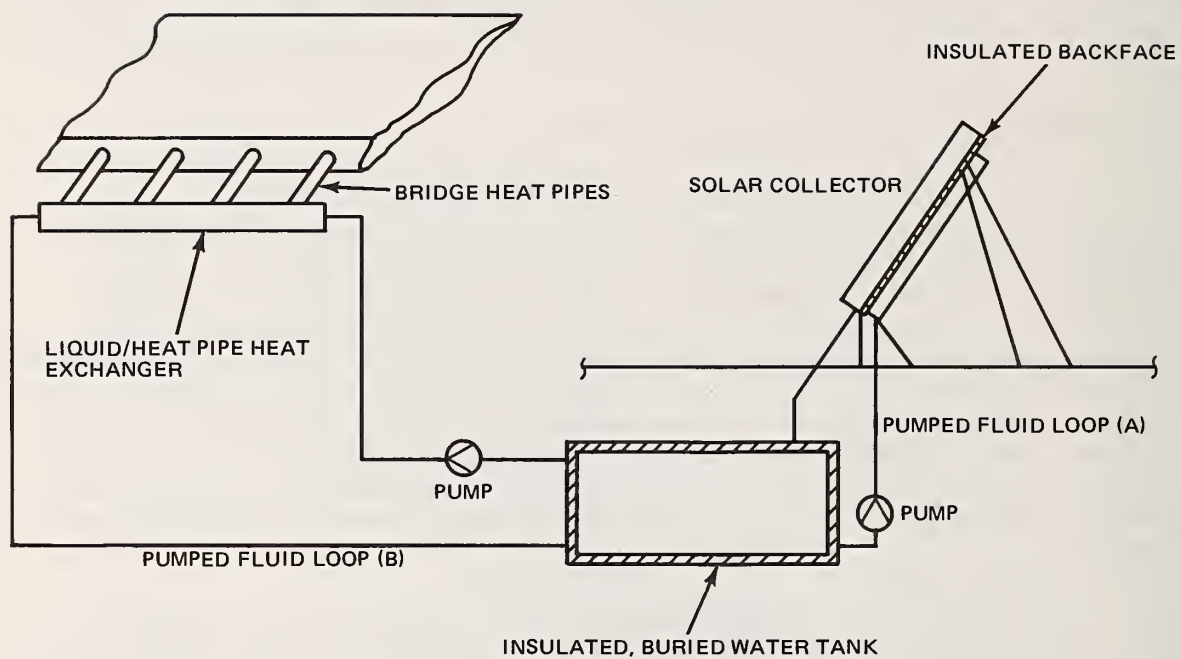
Schematic of solar collector/heat pipe design to prevent icing on highway bridge decks
